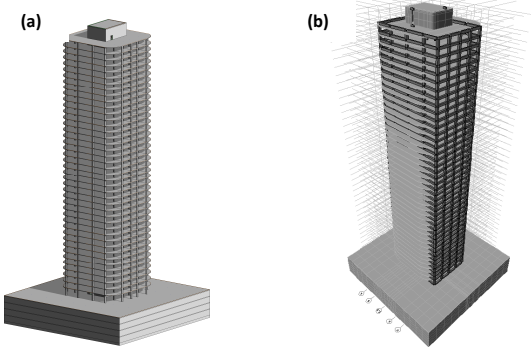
Three-dimensional view of the buildings, (a) Building 1, (b) Building 2
